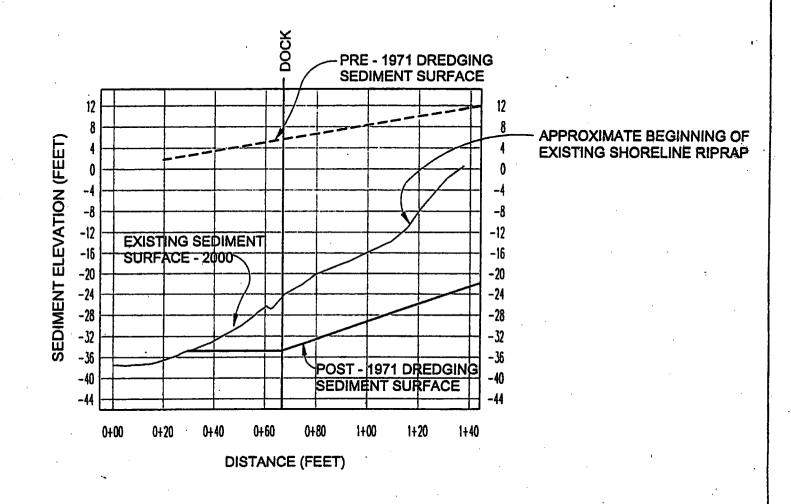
3 CROSS SECTION VIEW, B-B' Expanded Preliminary Assessment for the Linnfon-Site
